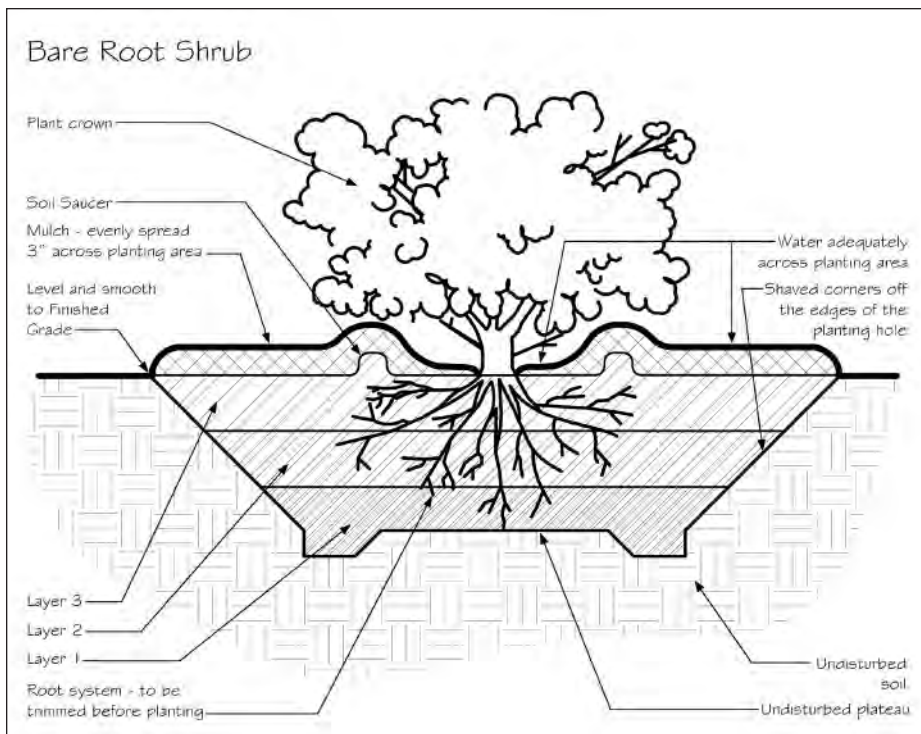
Planting detail – bare-root shrub. (Source: Robert Schutzki; graphics by Kristin Faasse.)
